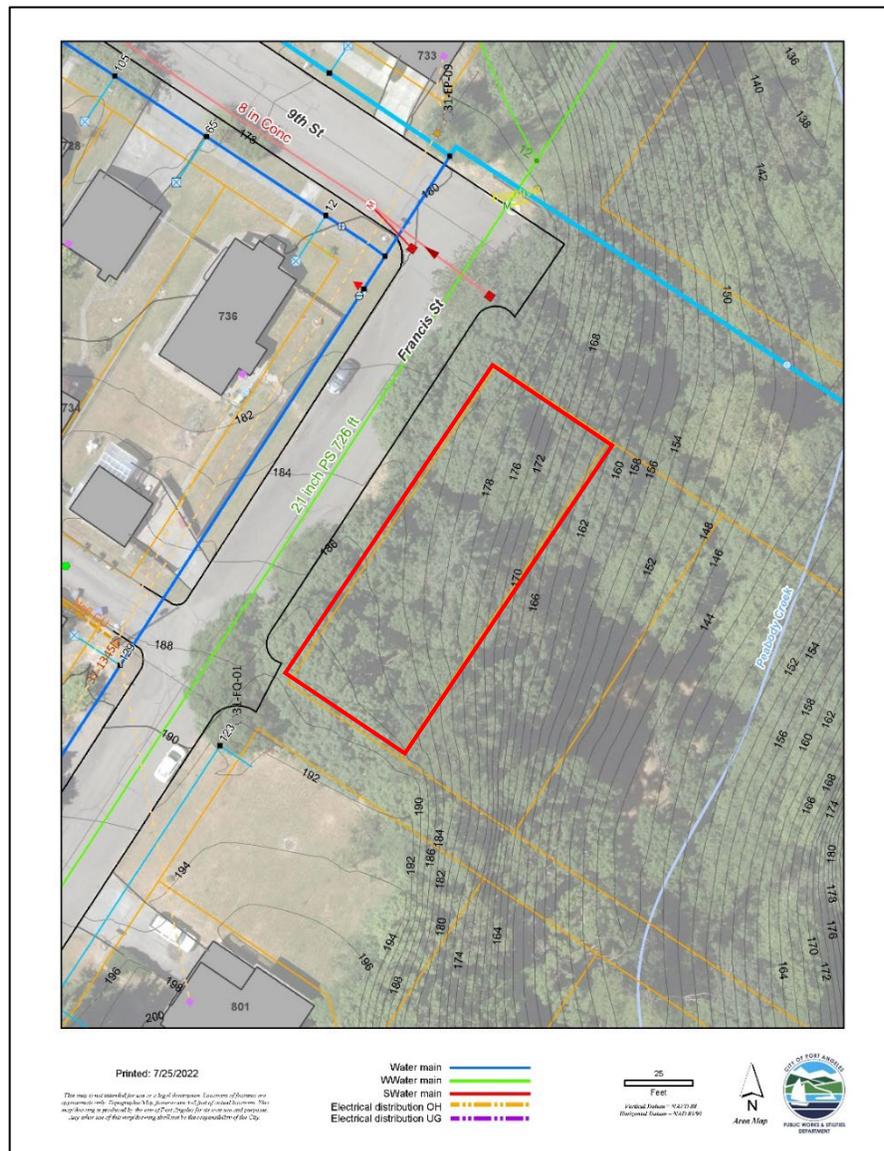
Site Plan with the location of available existing utilities and 2-ft contours (subject site in red)
